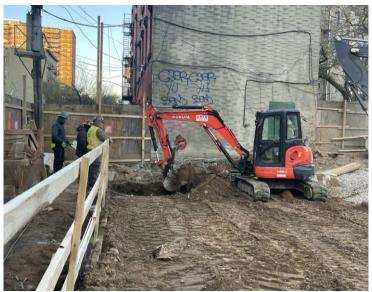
View of Rise excavating non-hazardous fill in the southwestern part of the site for SOE lagging installation (facing west).
